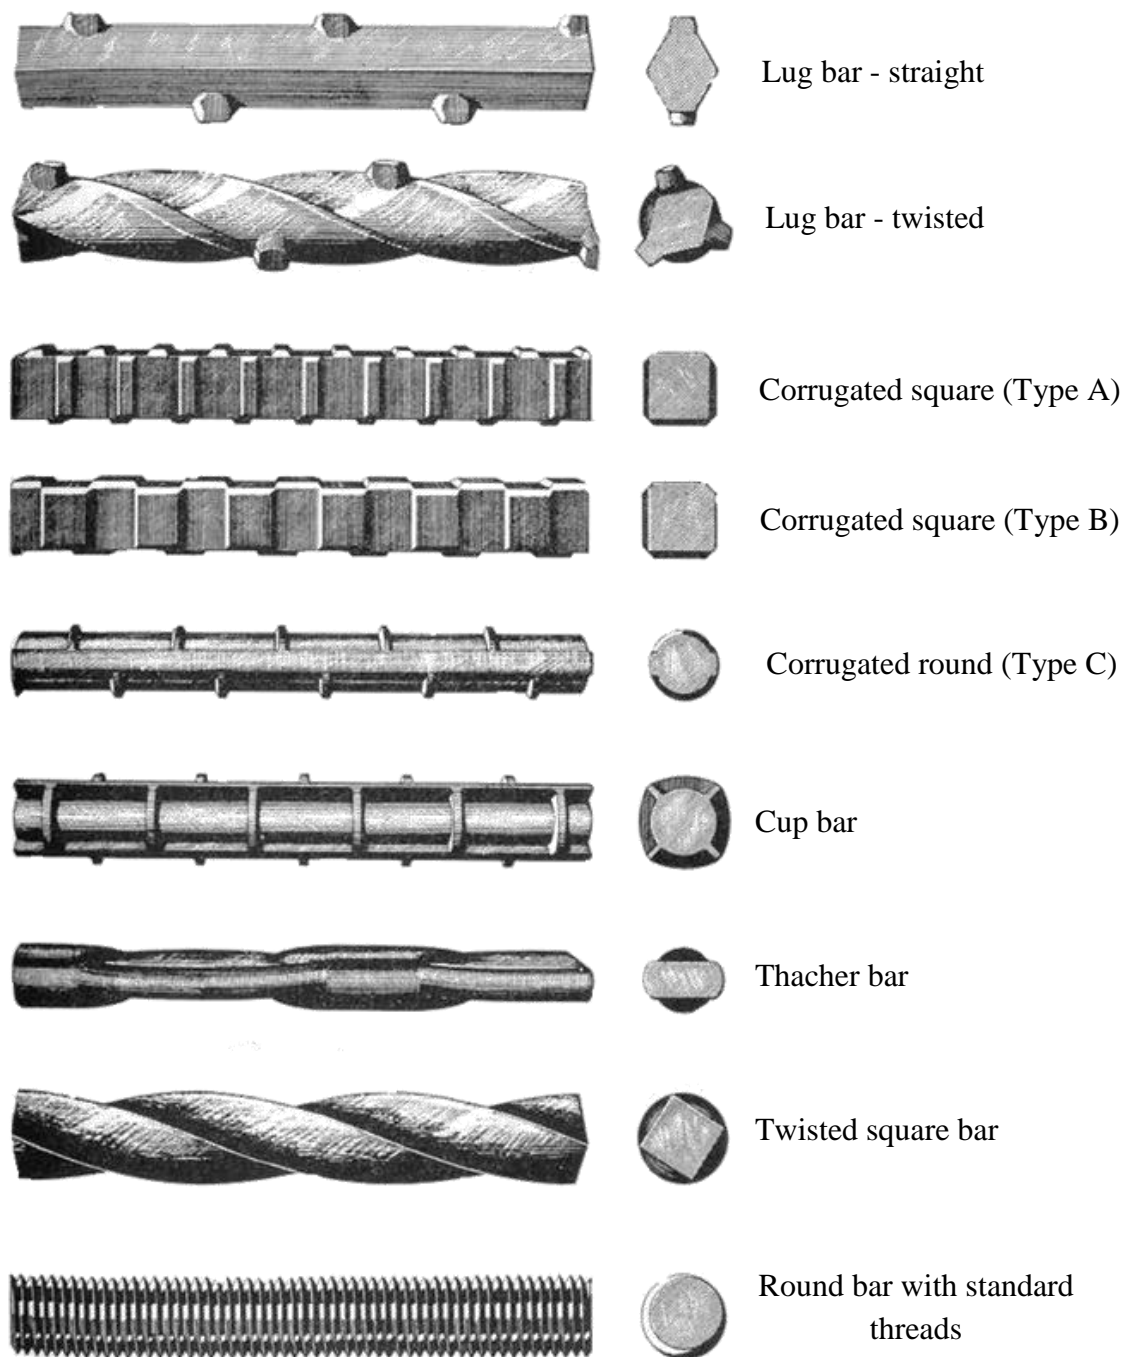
Deformed bars used in historical concrete structures (Abrams 1913).
